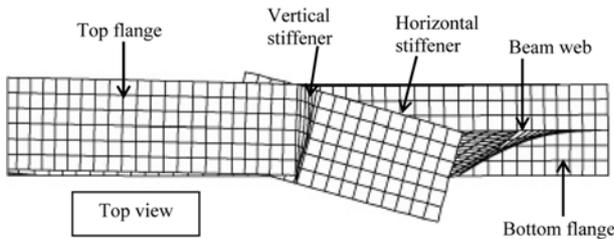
Buckled mode shape of coped I-beam with both horizontal and vertical stiffeners.
